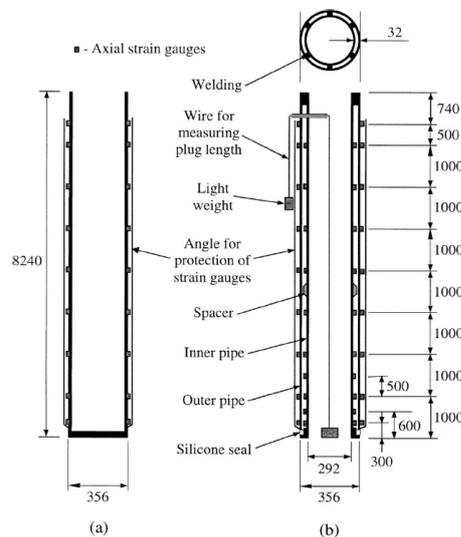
Dimensions and pile set up for (a) closed-ended and (b) open-ended pile (Paik et al., 2003)
